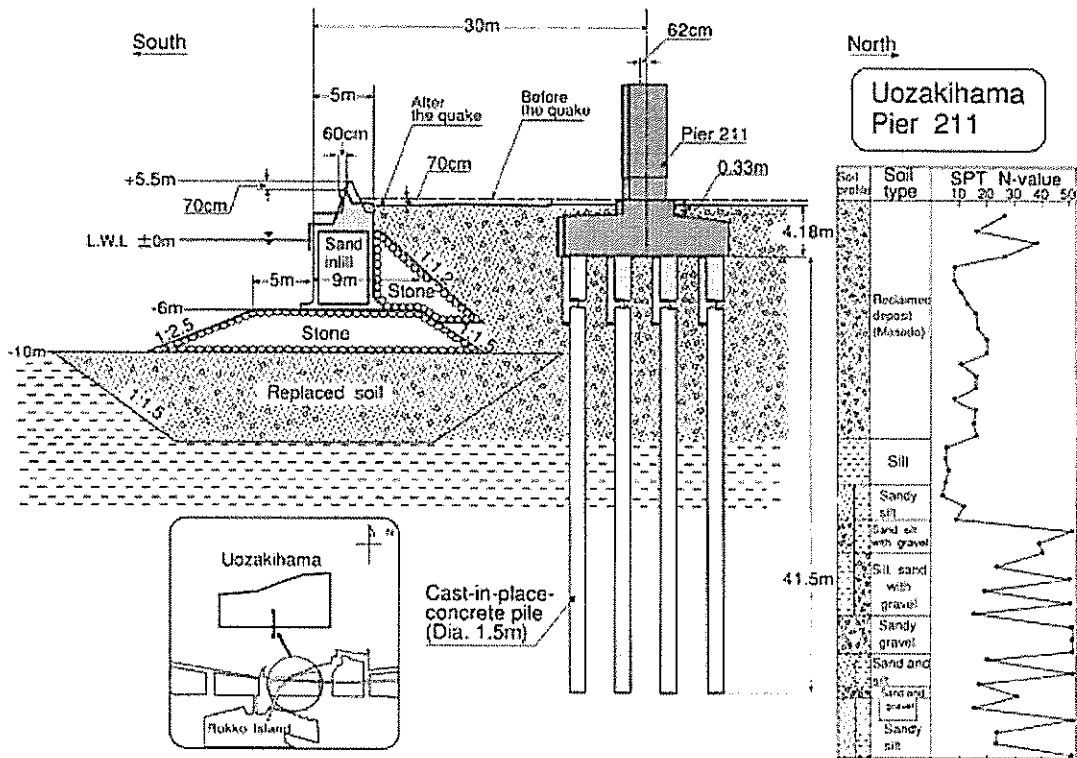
Quaywall, Foundation and Soil Conditions at Pier 211 (Hanshin Highway Authority, 1996).
